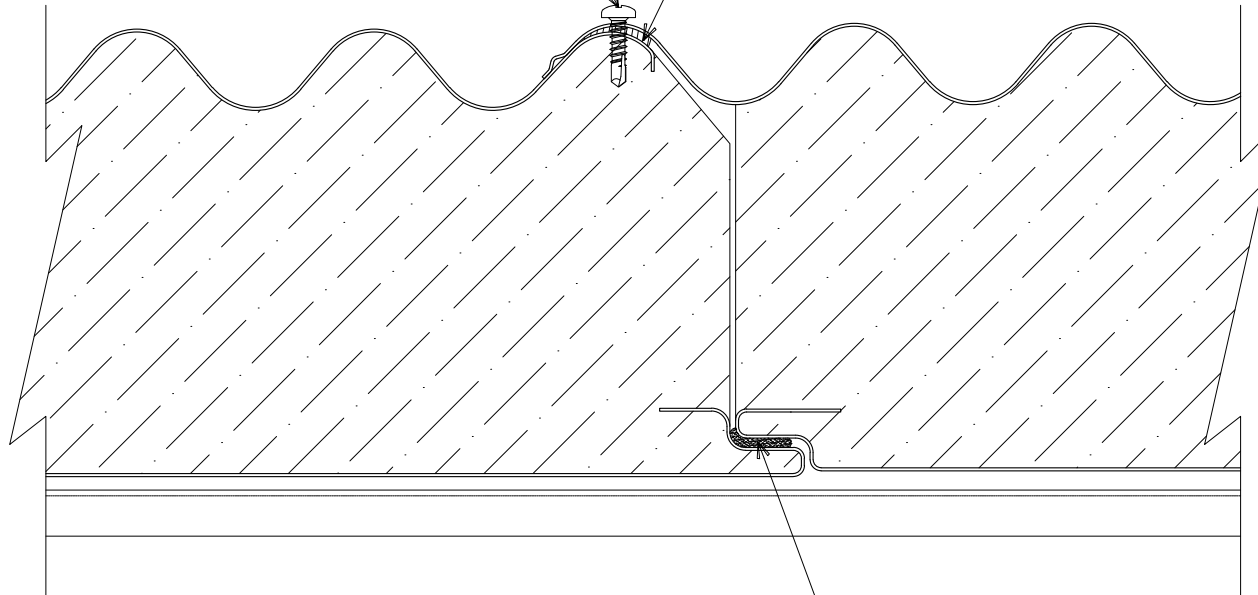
DETAIL:	WALL PANEL THROUGH FASTENING		SHEET:
